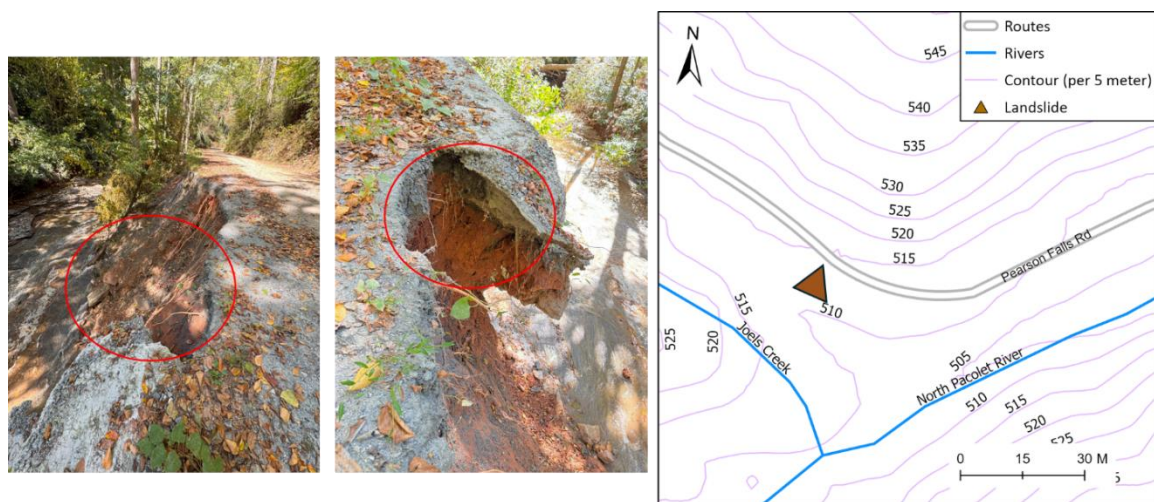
Mass loss behind the grout wall after landslide. (Photo Credits: Sophia Lin and Shen Chen)
